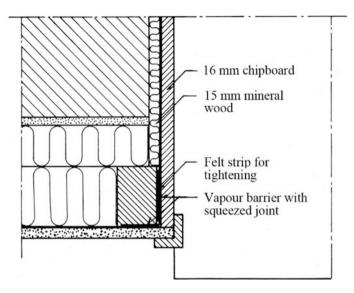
Additional insulation placed behind new opening reveal linings to reduce cold bridges around windows
